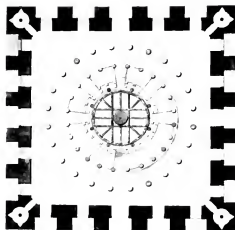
, PLATE 43. First floor plan of a windmill, in black and yellow
